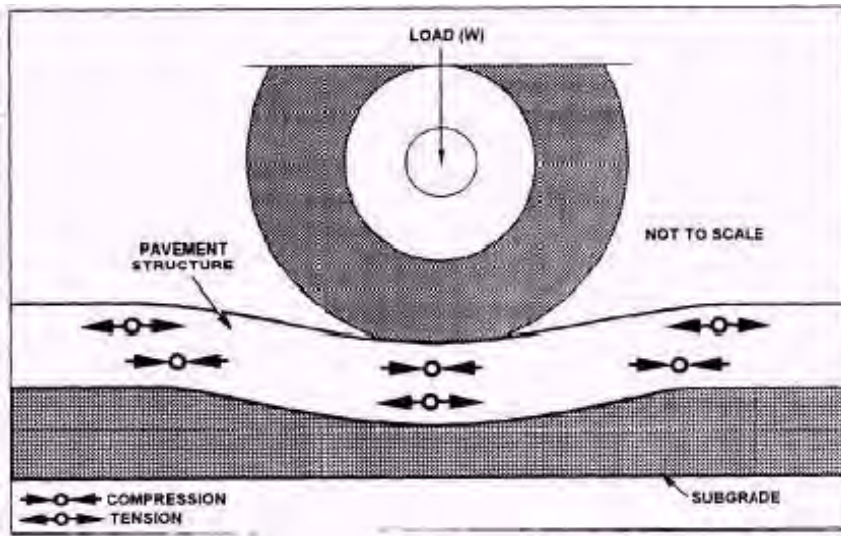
Pavement Deflection Results in Tensile and Compressive Stresses in Pavement Structure
